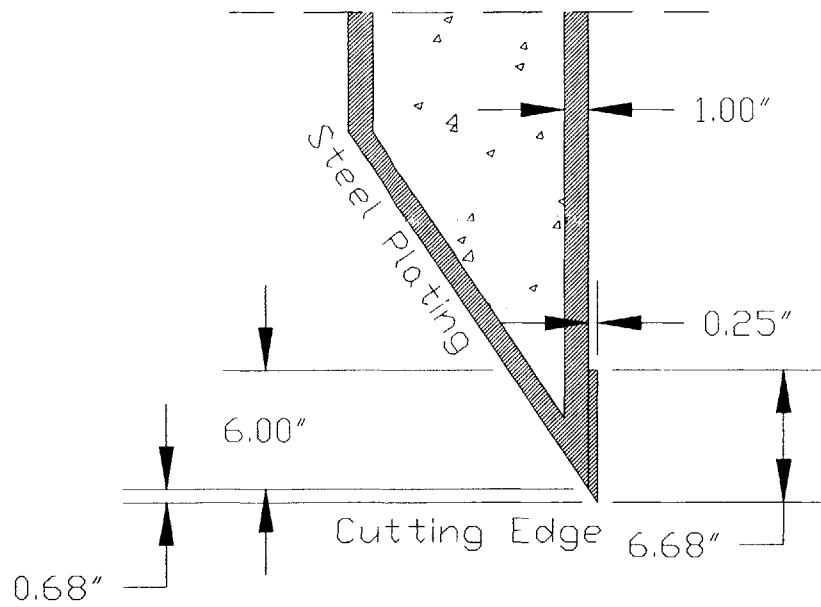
Section of heavy shoe for land caisson (from Swatek, 1975)
